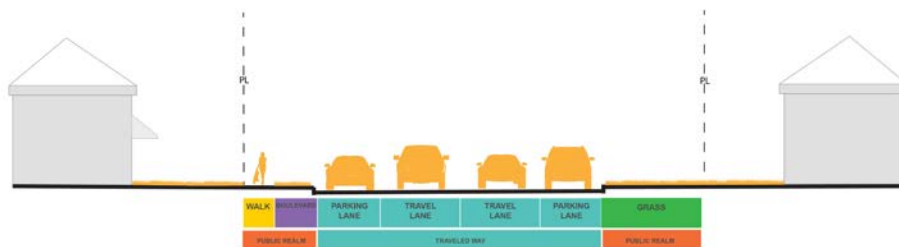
Illustration of the existing typical cross section of 52 Street north of 53 Avenue.
